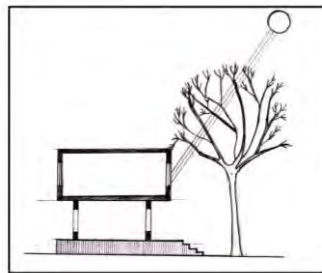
Plantation and shedding Section Shows deciduous trees provide access to winter sun but protect against summer sun
